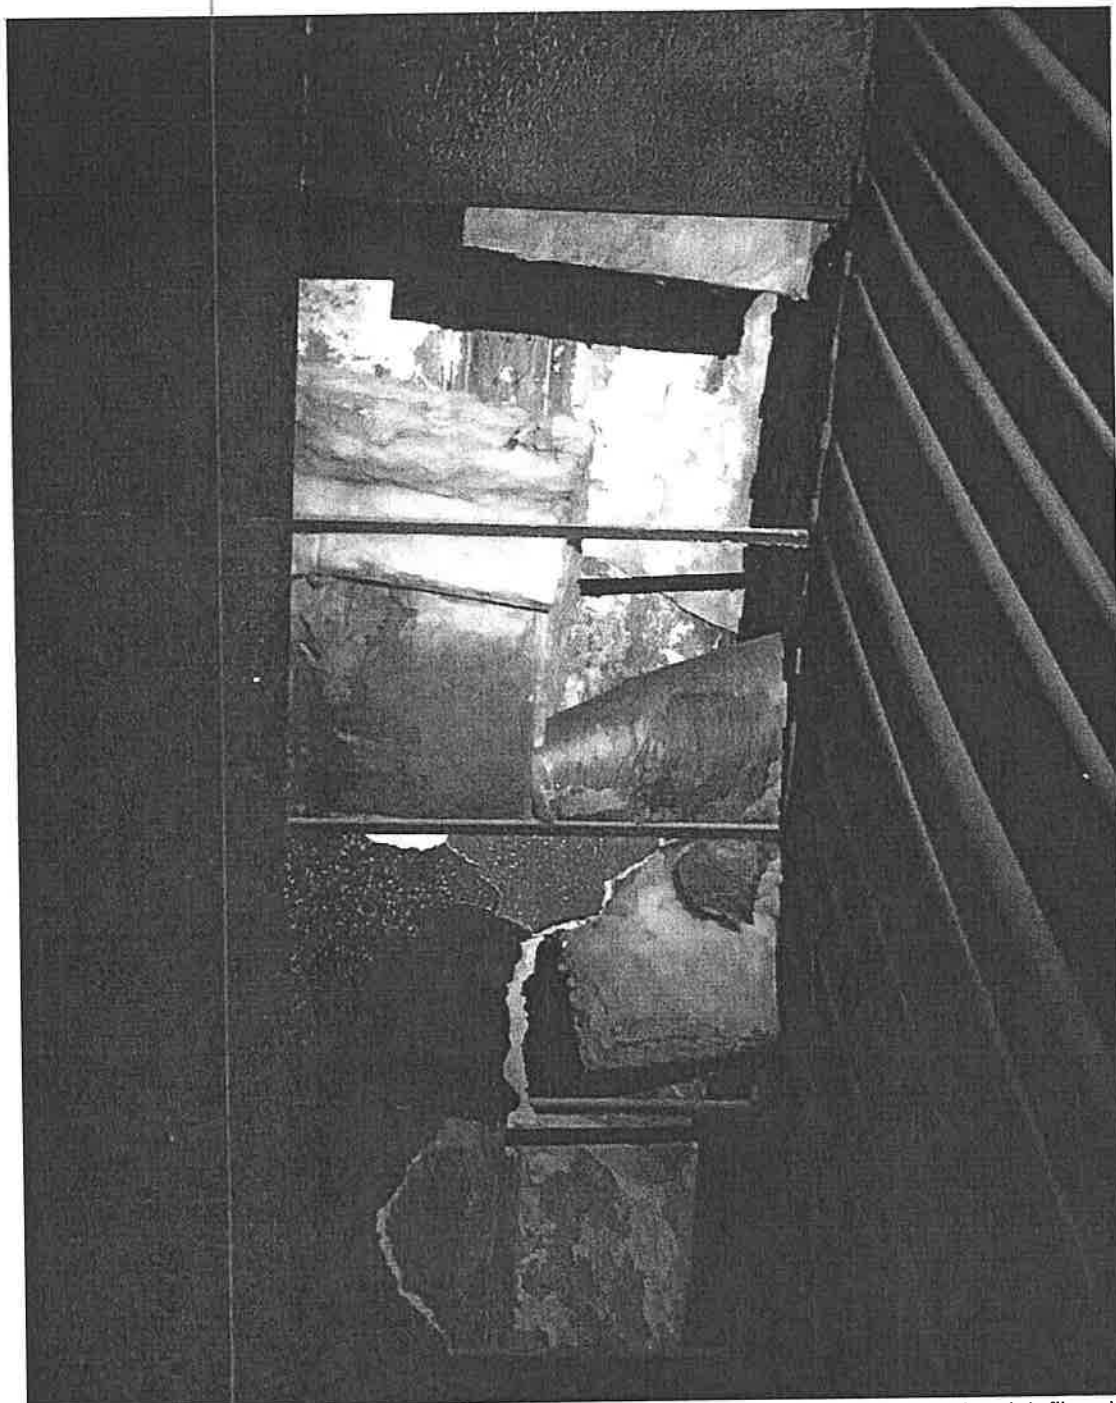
View up at theater ceiling. Where damaged acoustical tiles have fallen, moist pink fiberglass insulation is visible and beyond, original ornamental plaster is moisture damaged and friable.
